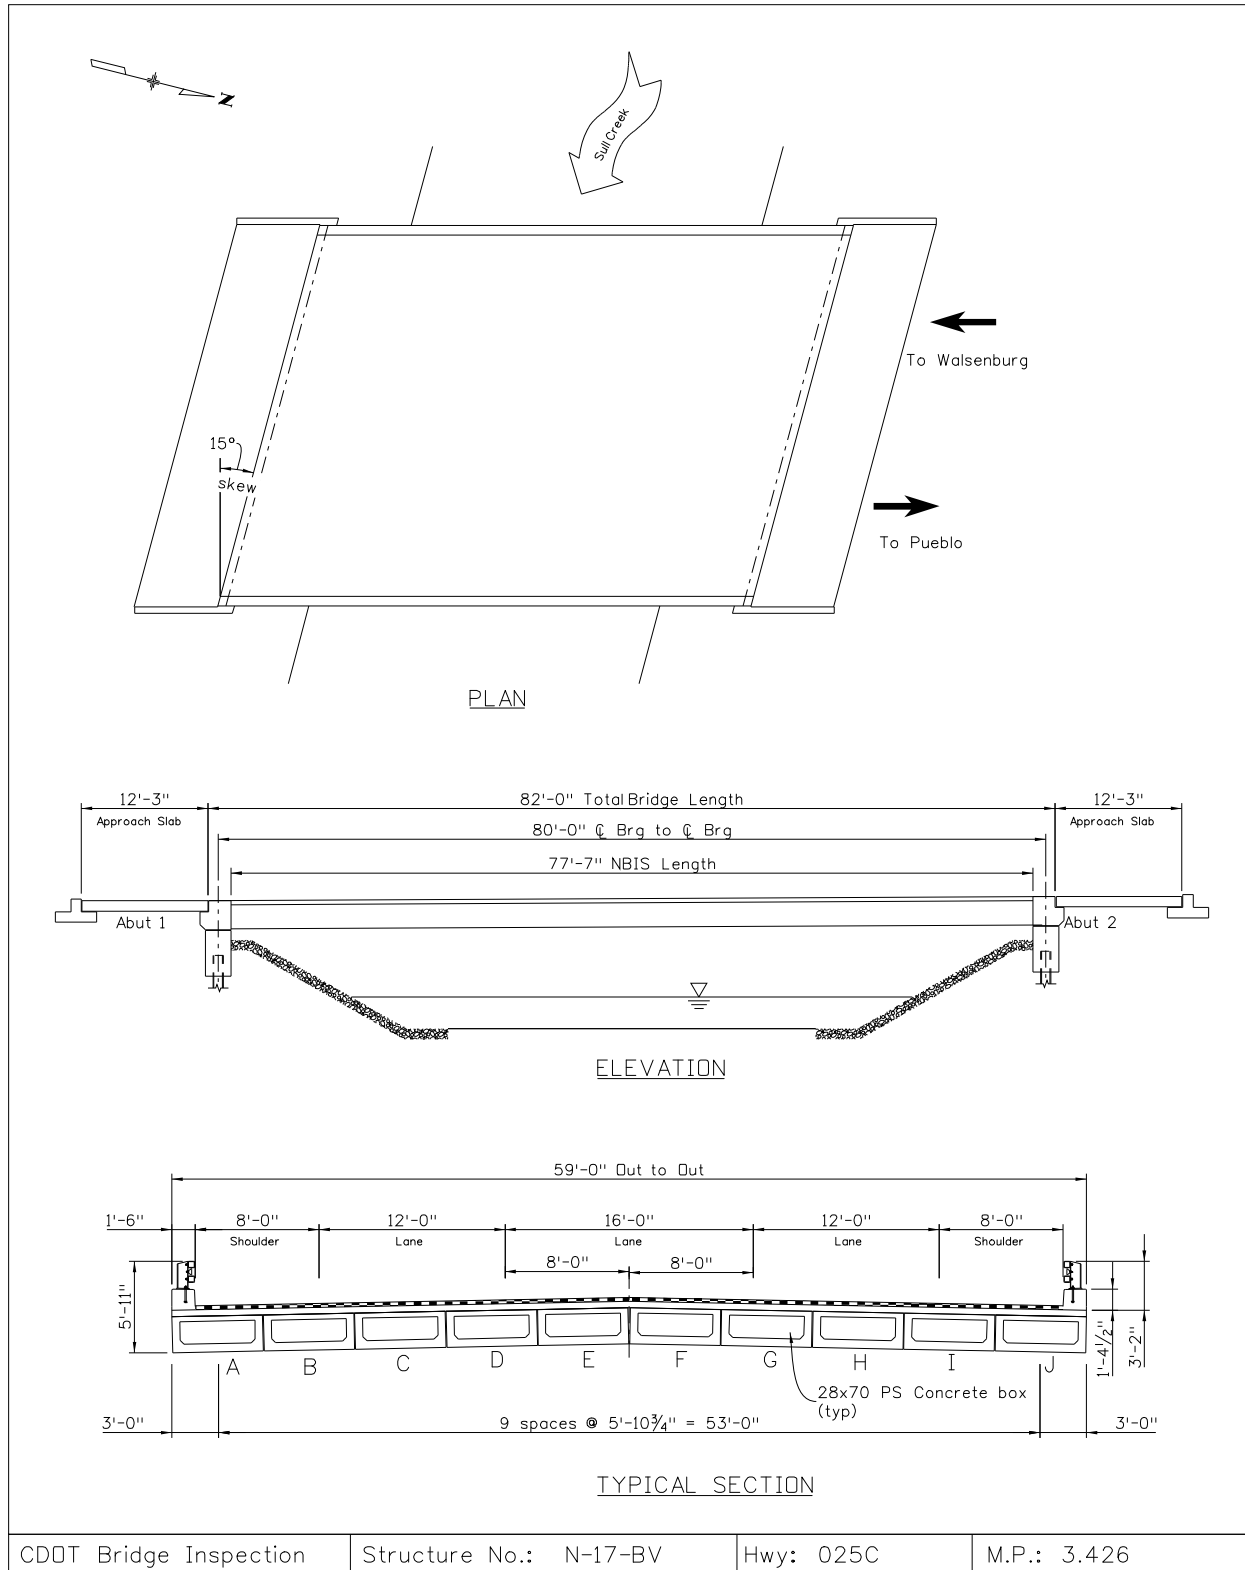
Bridge Inspection Sketch – Example 2
